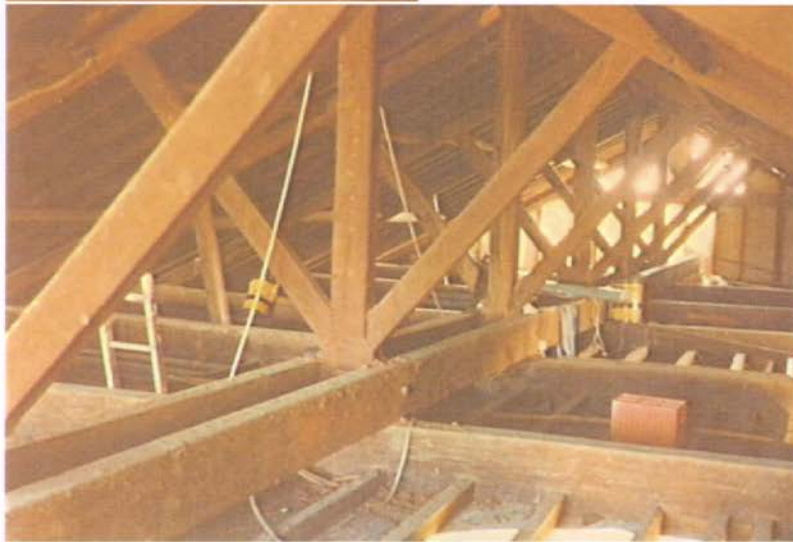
The king post trussed roof structure. Source: Campbelltown City Library, Local Studies Collection (02/003868)
